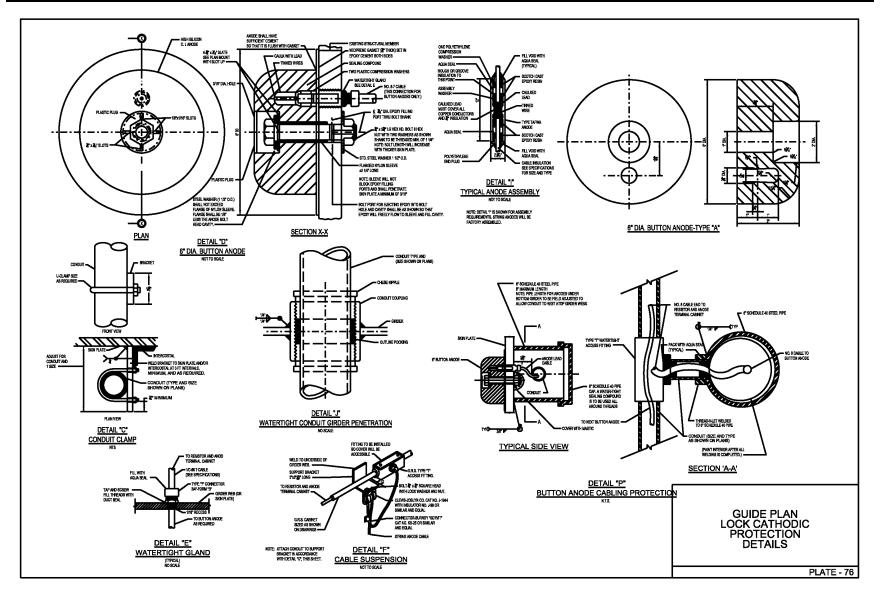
Plate 76: Guide plan, lock cathodic protection details
